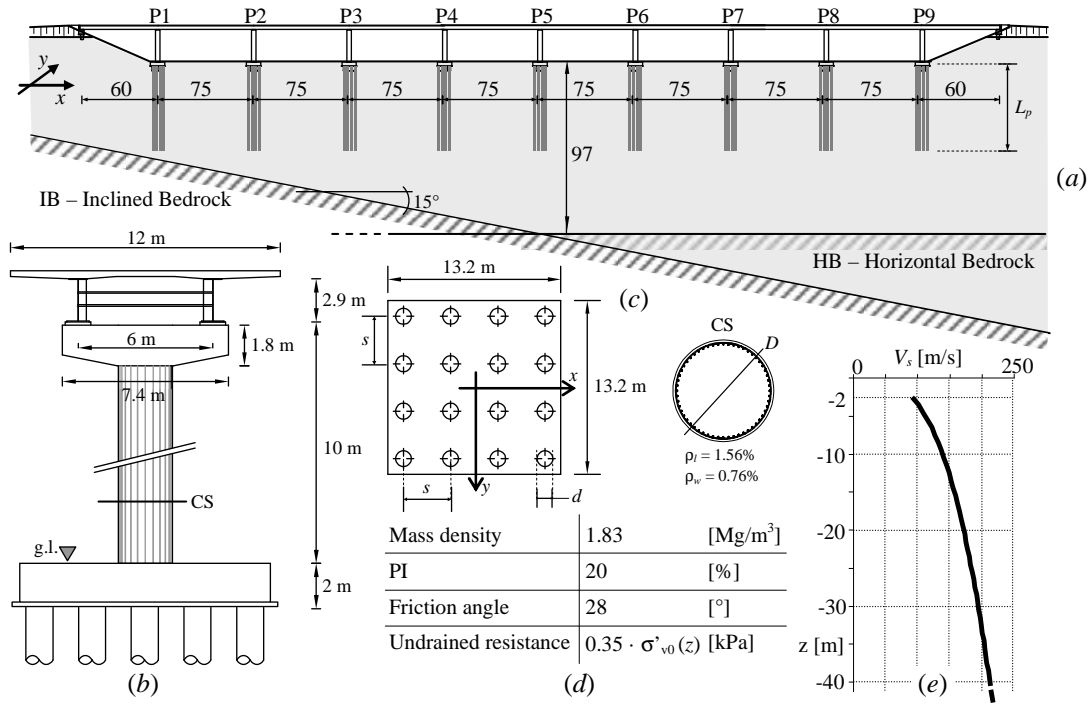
(a) Lateral view of the viaduct; (b) pier elevation; (c) foundation and pier cross section; (d) soil mechanical properties and (e) V_s profile down to 40 m
